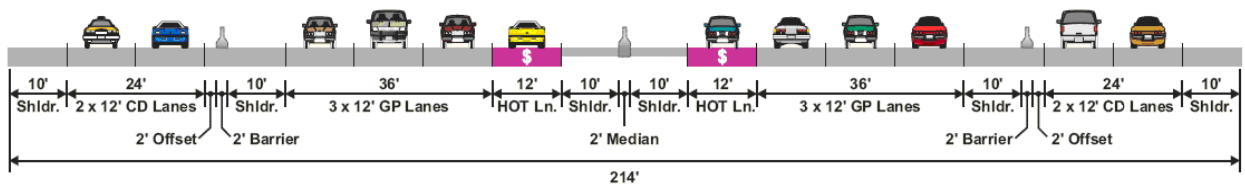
Typical Cross Section – Alternative 1 (Montrose Road to Spur)
